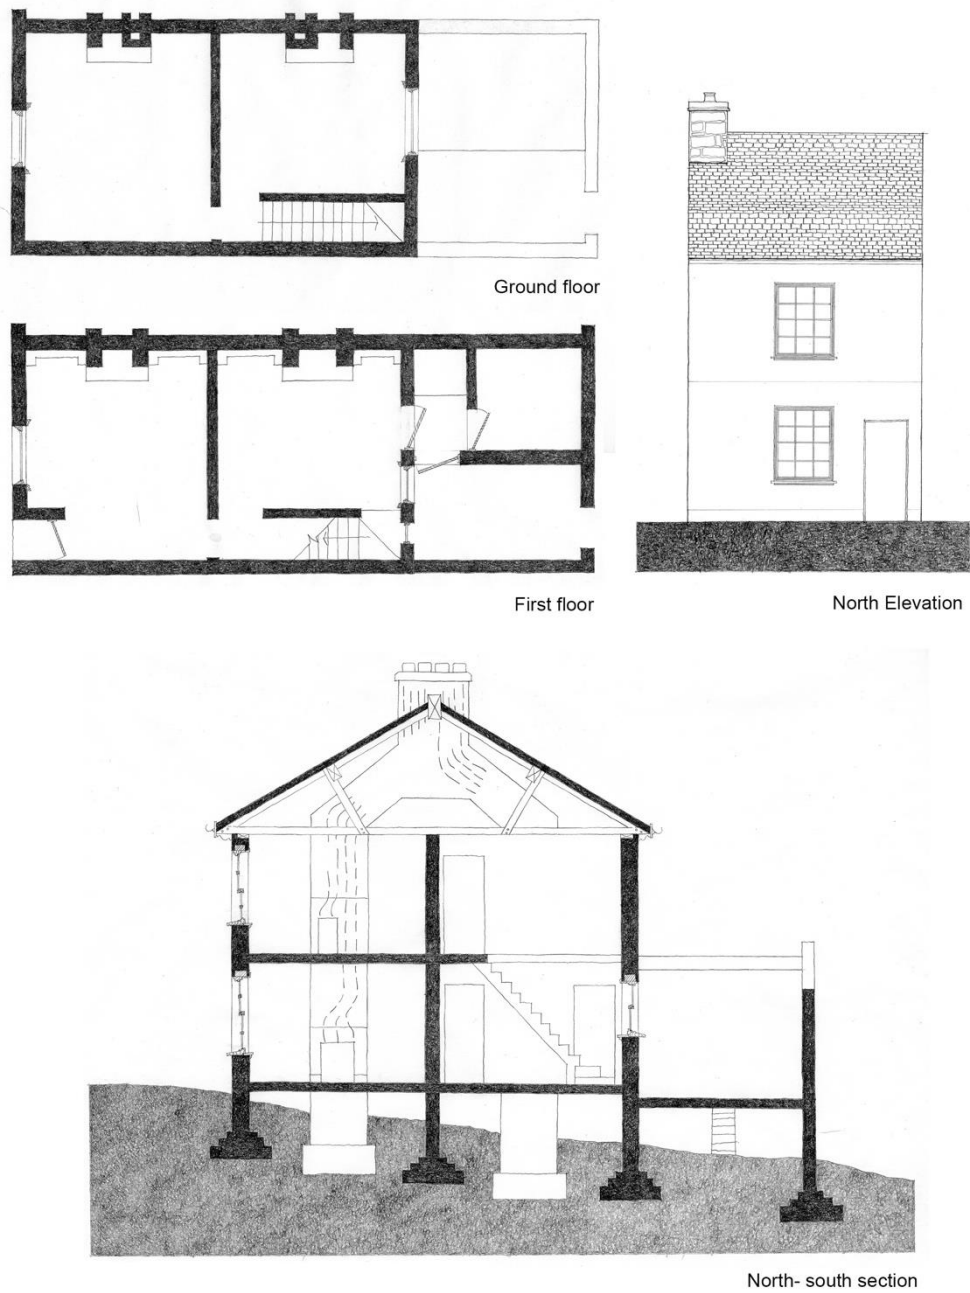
Floor plan and street facing elevation of No.7 Church Street
